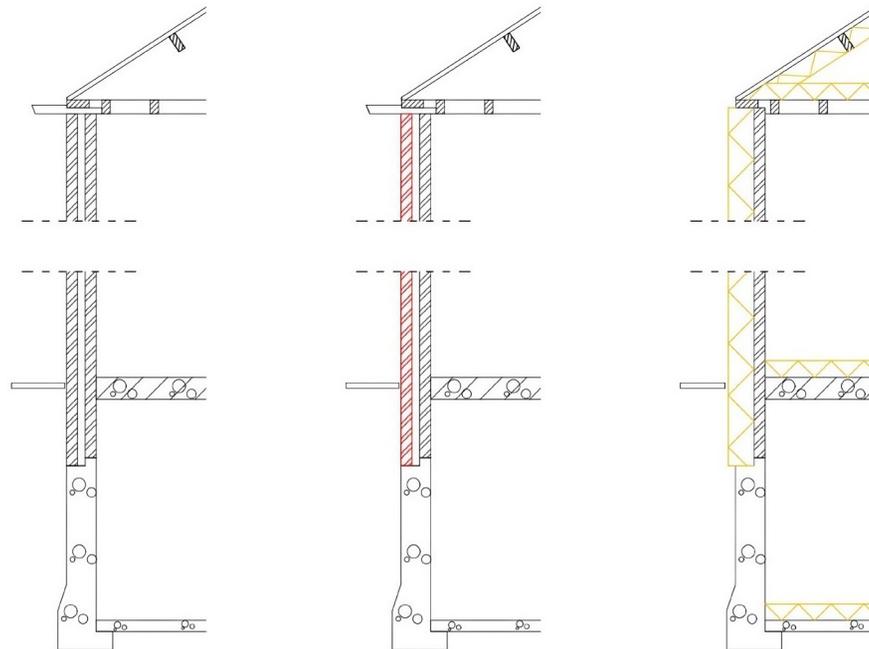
Insulation addition and structure of renovated wall (existing façade in grey, the brick layer to be demolished in red, and the new insulation addition in yellow)
